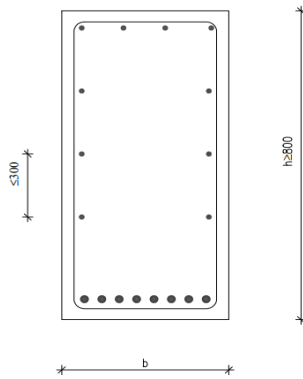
Additional reinforcement for deep beam when $h \geq 800$ mm.
